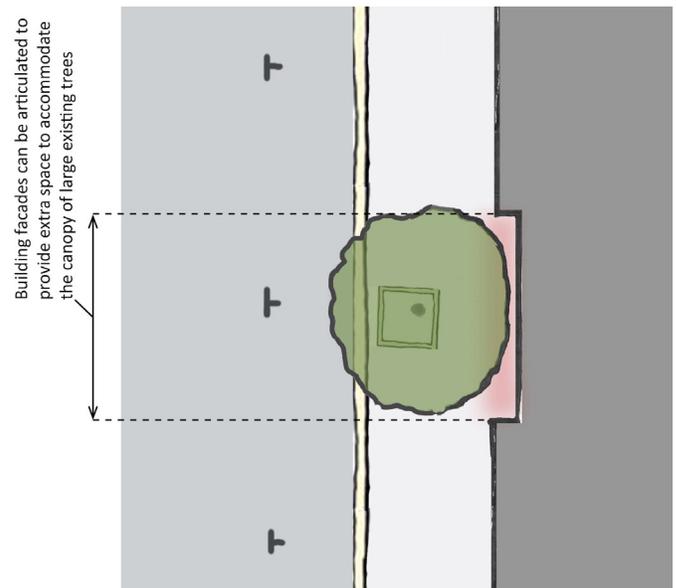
Building facades can be articulated to provide extra space to accommodate the canopy of large existing trees.
